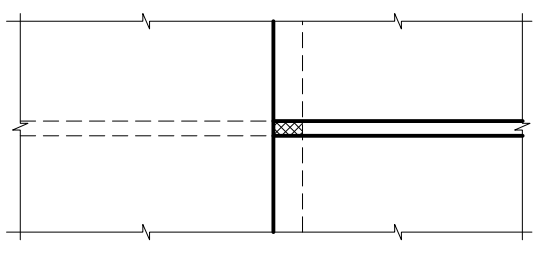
DETAIL "L" - TRANSITION FOR EXTERIOR WALL/SLAB EXTENSION
